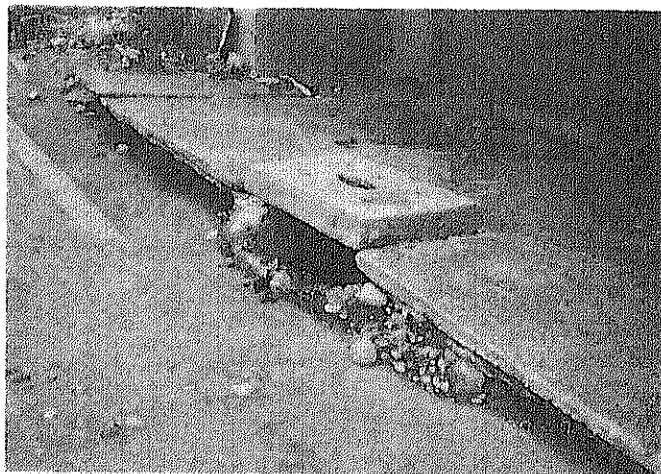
Damage to drain-ditch in Dagupan City
